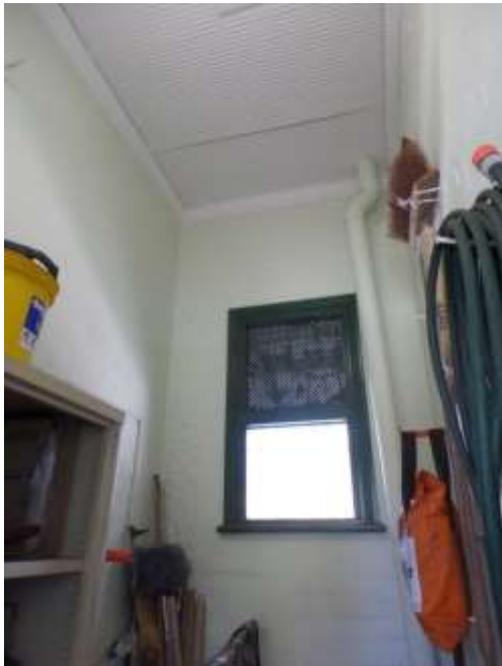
View west (left) and south (right) into the existing Sec/Comms room, showing the small size, the ripple-iron roof and the brick wall proposed for removal.
